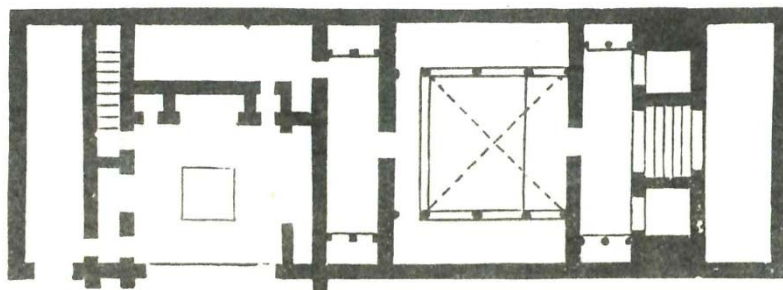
Ground floor plan of El Bañuelo (after R. Contreras, 1878).
